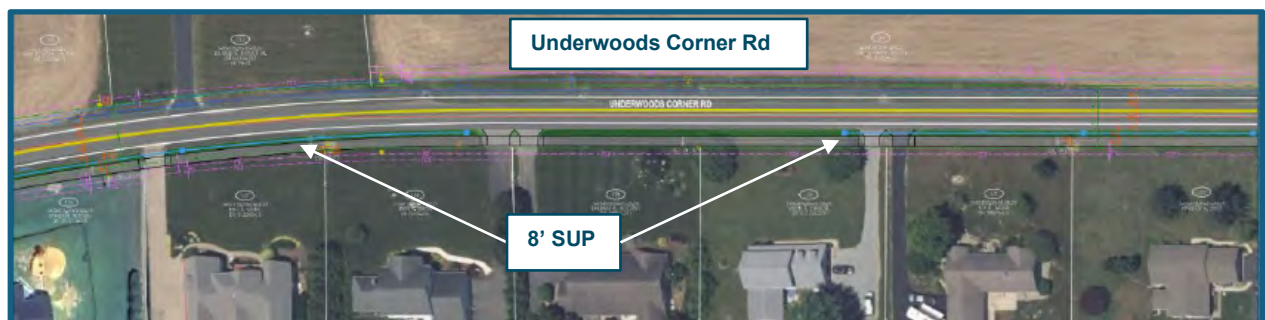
Underwoods Corner Road - Shifted North Toward the Field
